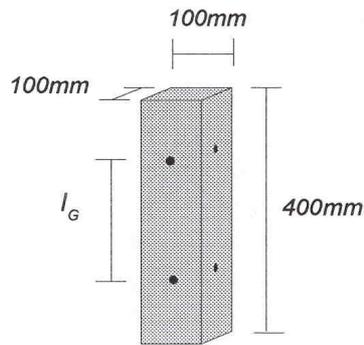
DEMEC: measuring points and dimensions of the test specimens.
